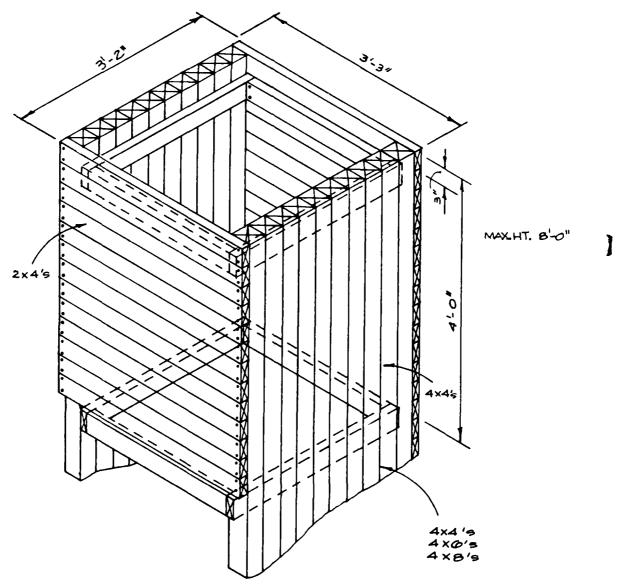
40 psi Entrance Structure to Key Worker Shelter (Wood Construction).
